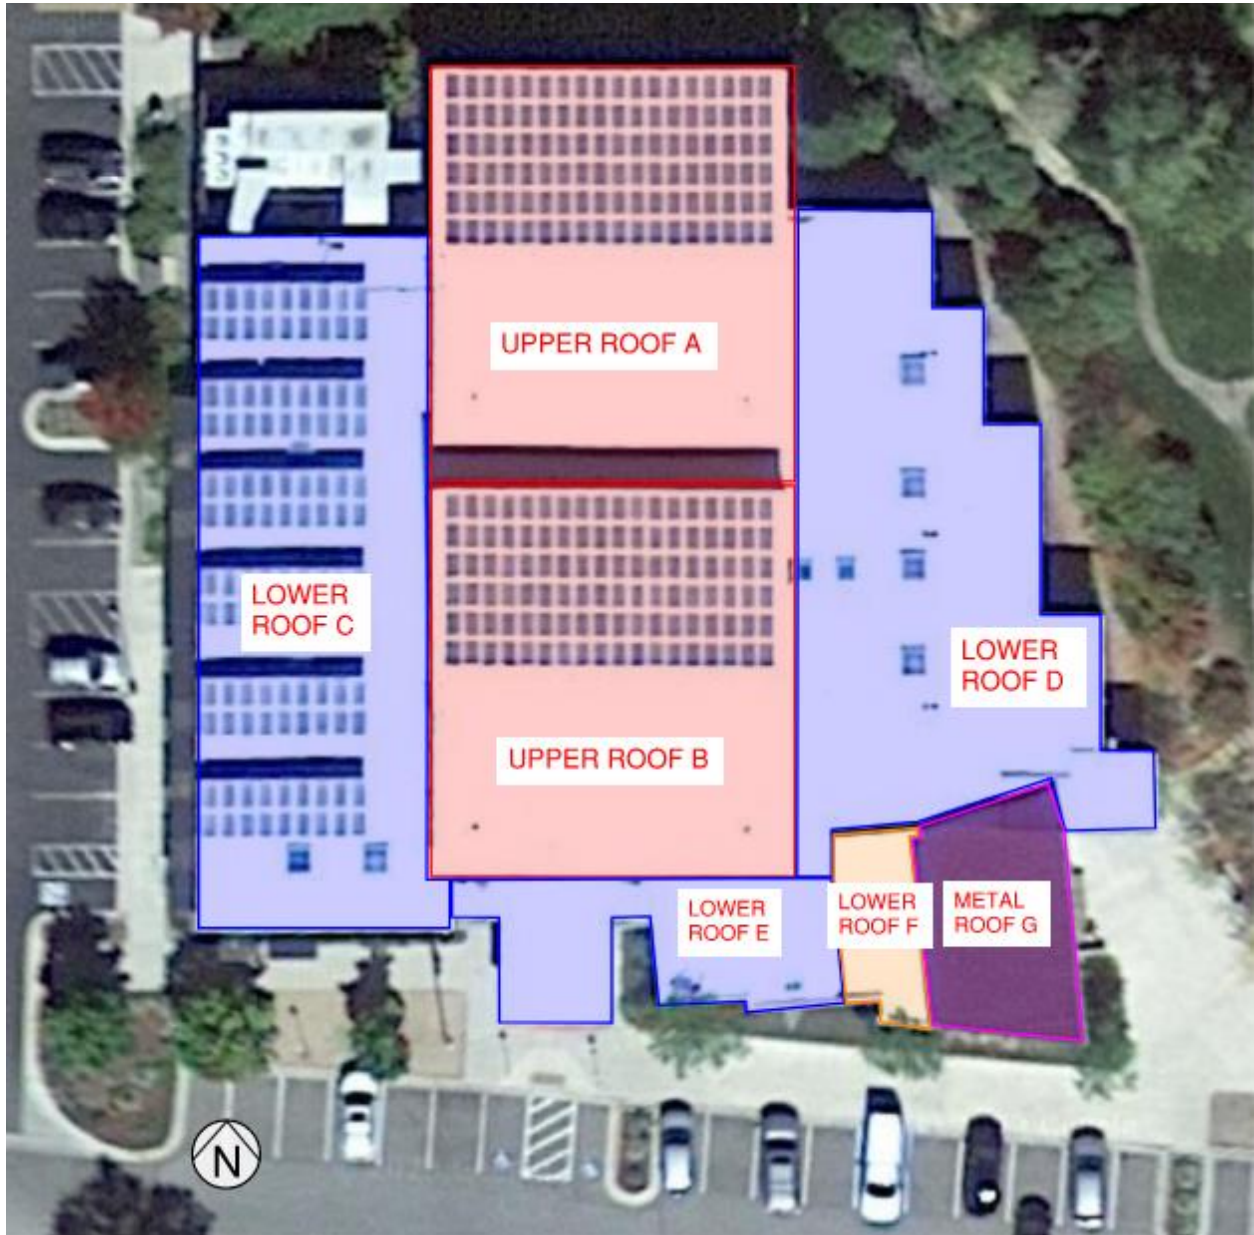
Aerial view of the Library roof with roof area labels for identification.
